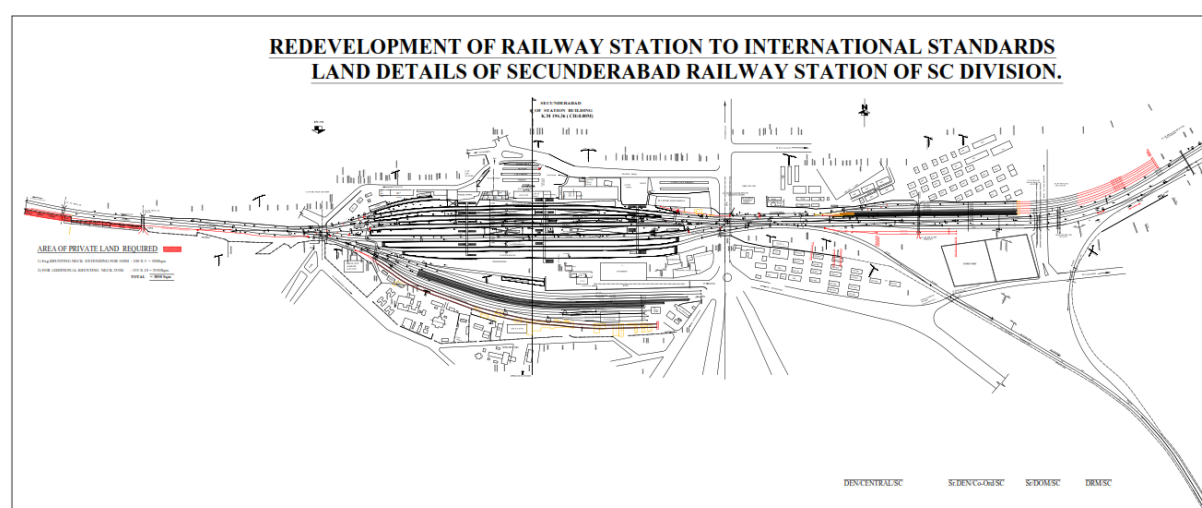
Yard plan and station land plan of Secunderabad railway station
